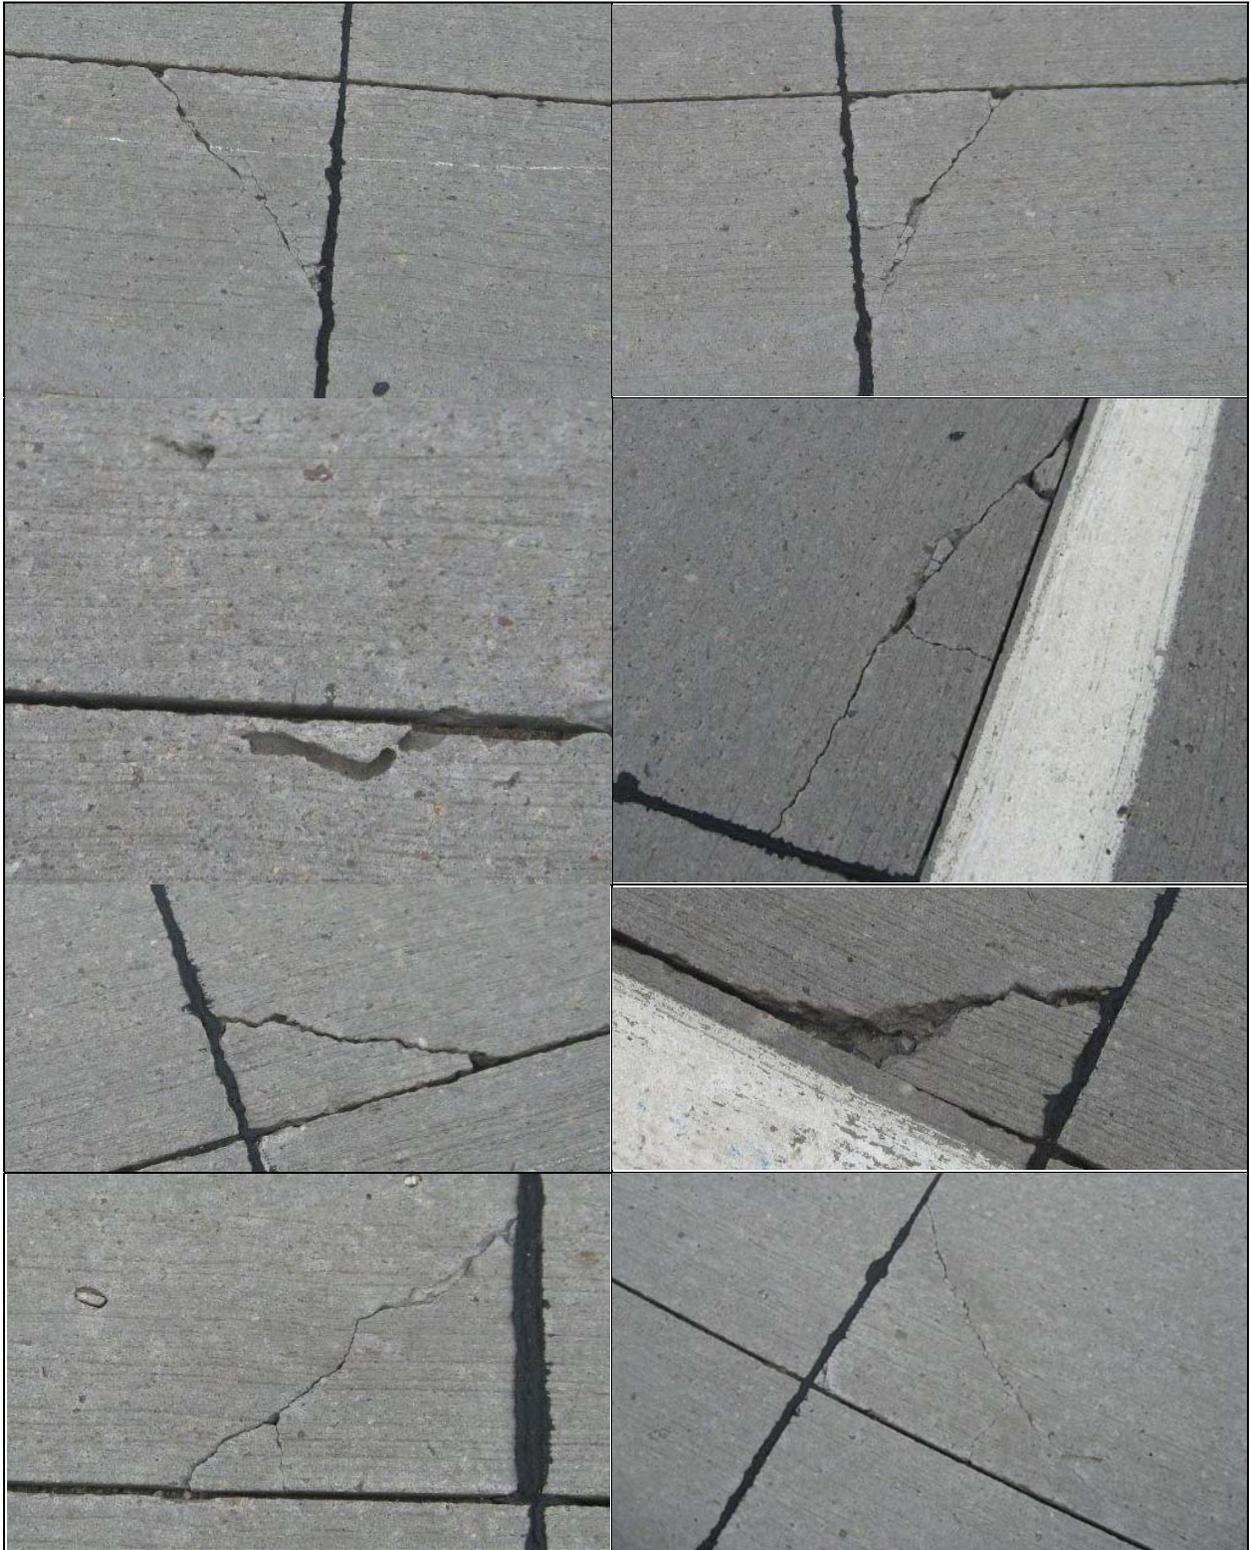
Corner cracks identified on I490W distress survey, August 2009.
